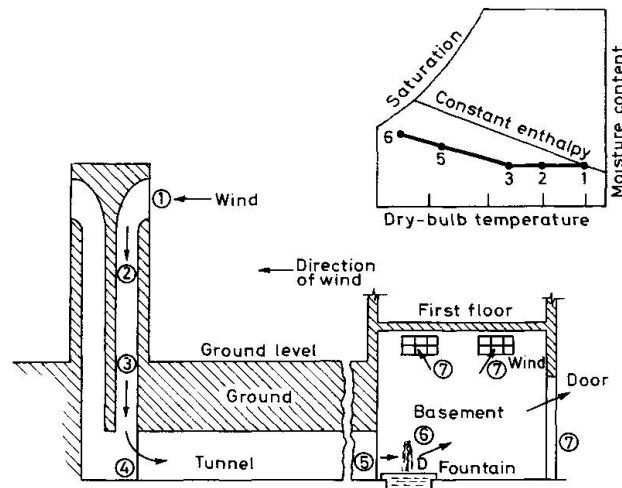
(a) The cross-section of a wind tower connected to the basement by a 50-m-long moist underground tunnel (12)
